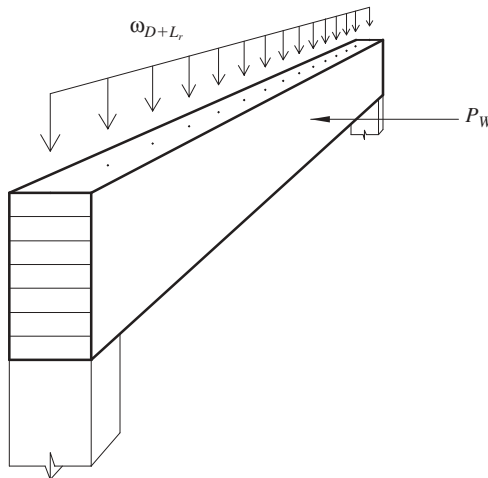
Biaxially loaded beam—Example 4.5-1.
